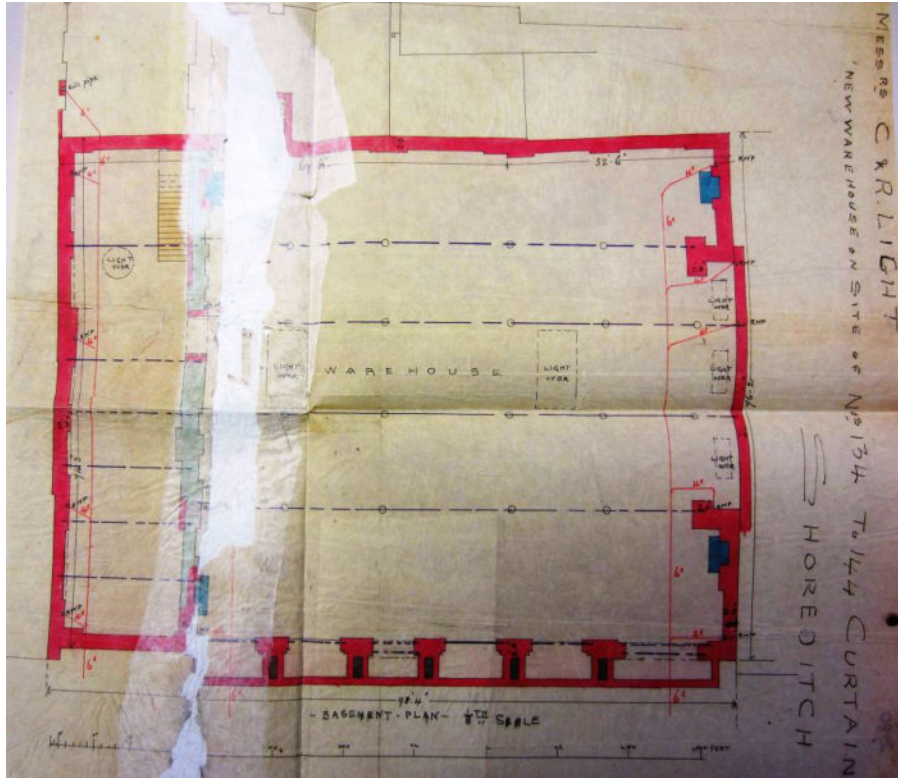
Basement plan for nos. 134-144 Curtain Road, c1881 (Hackney Archives, drainage plans 2980)
